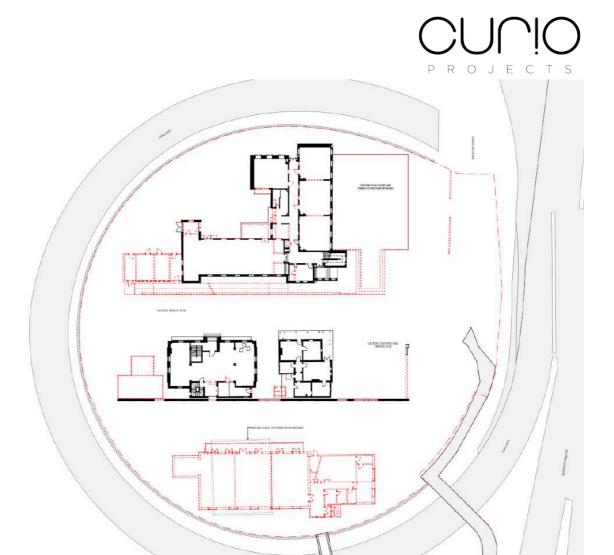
Ground Floor Demolition Plan (Source: FJMT Studio, DA-2101, SSDA01, 18.12.2019
